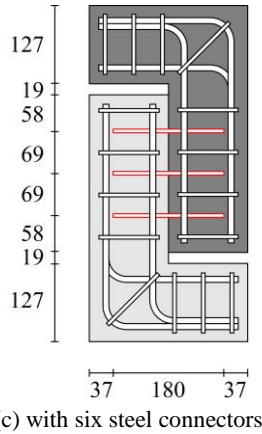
Configuration of reinforcement in push-off specimen (mm)
